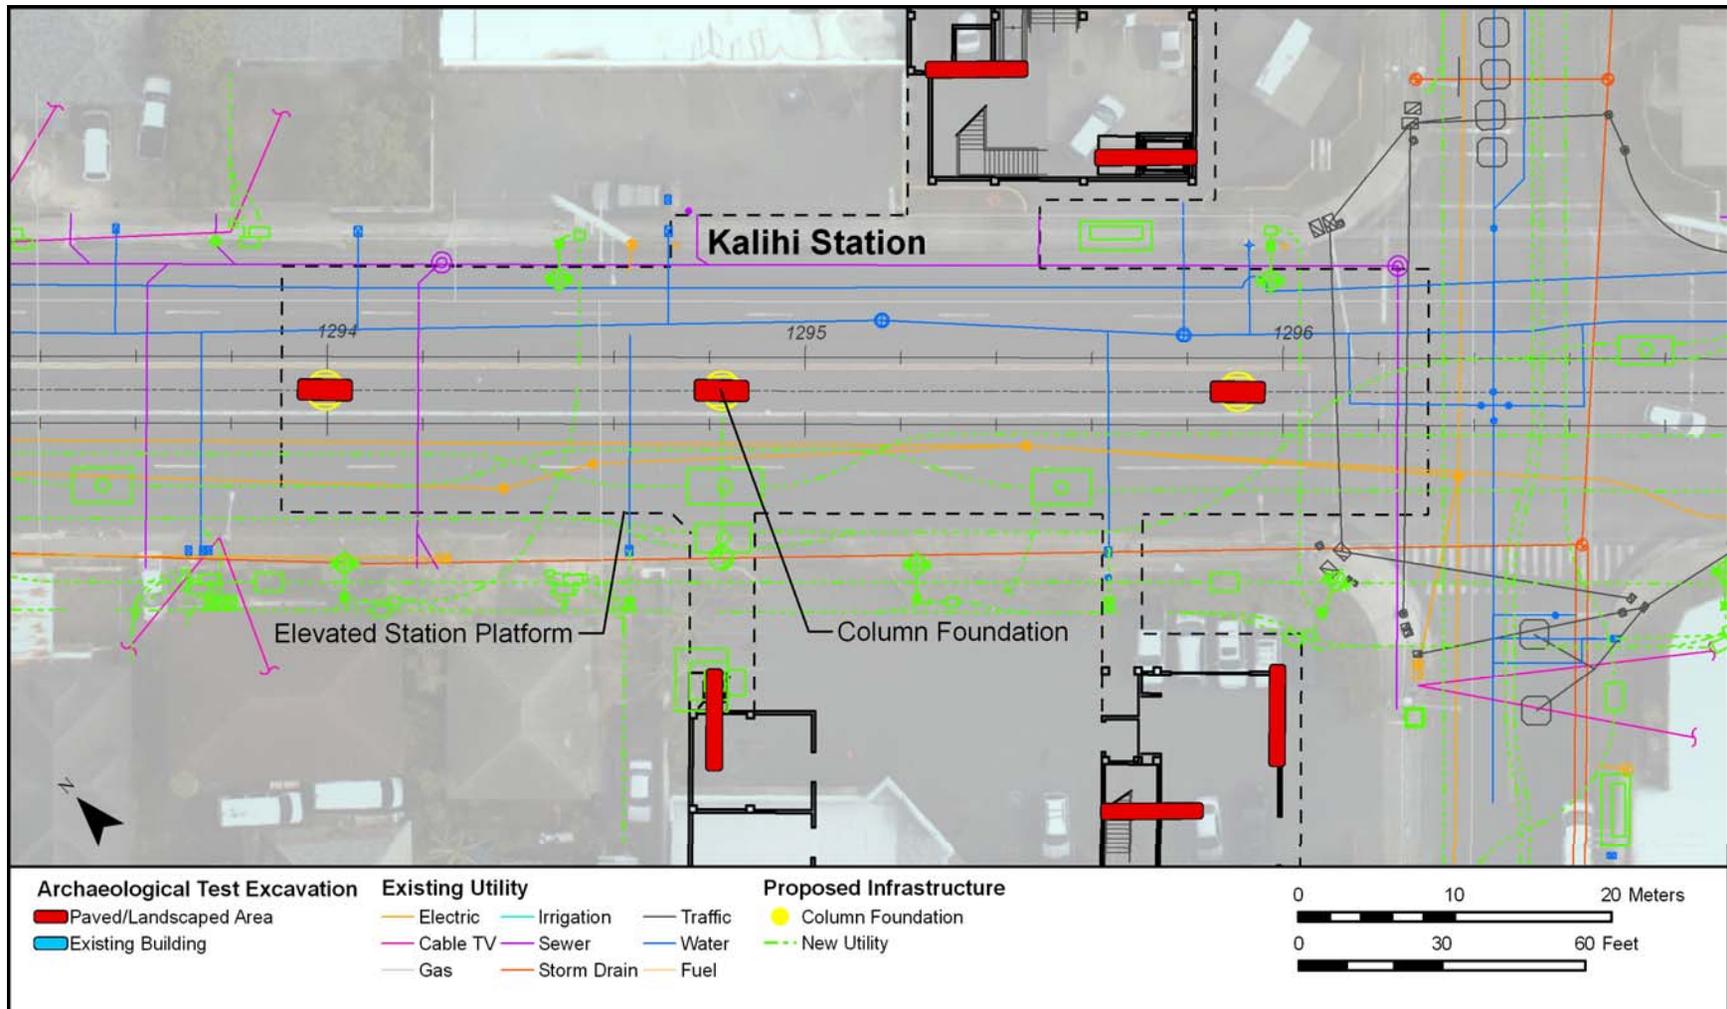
Kalihi Station, detail of column foundation layout at Dillingham Boulevard showing proposed locations for archaeological inventory survey testing (test three out of three station foundations with 3' by 10' test trench excavations)
